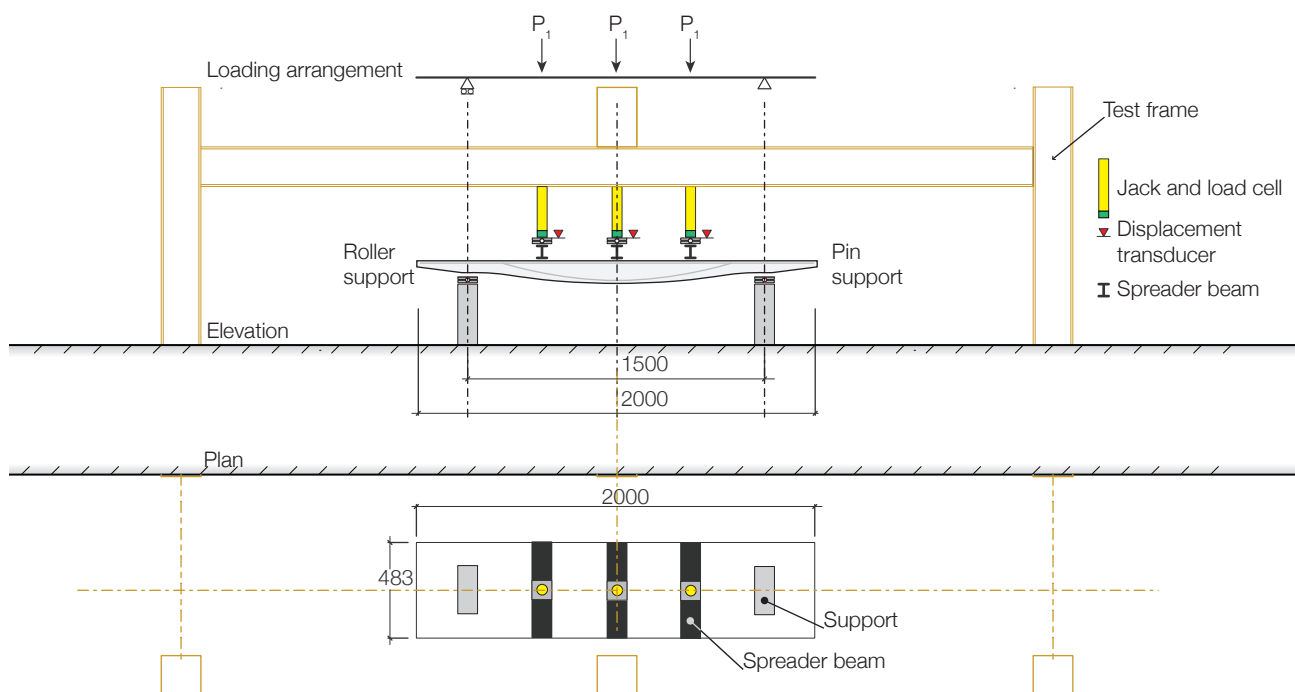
Testing arrangement, Beam 6\_2\_1.
